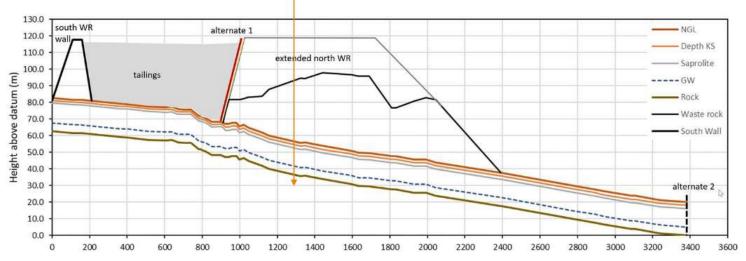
cross-section of the northern containment wall design from a western view. Source: SRK, 2022
